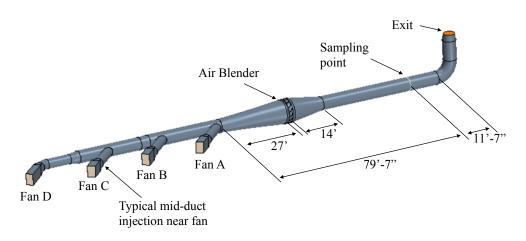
3420 Building Exhaust System with Static Air Blender.
